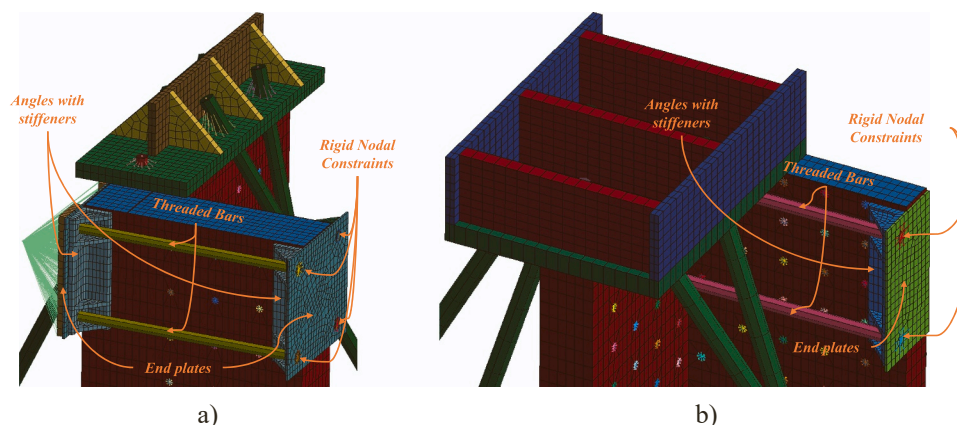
Finite element model of lateral loading setup for: a) C- and; b) T-shaped wall specimens.
